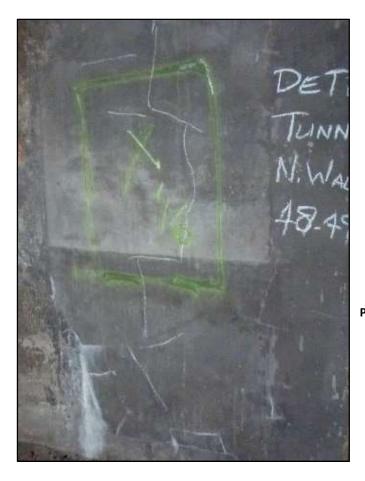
Delaminated Area (Highlighted in Paint) on New Wall Patch, Detroit Avenue Tunnel.
